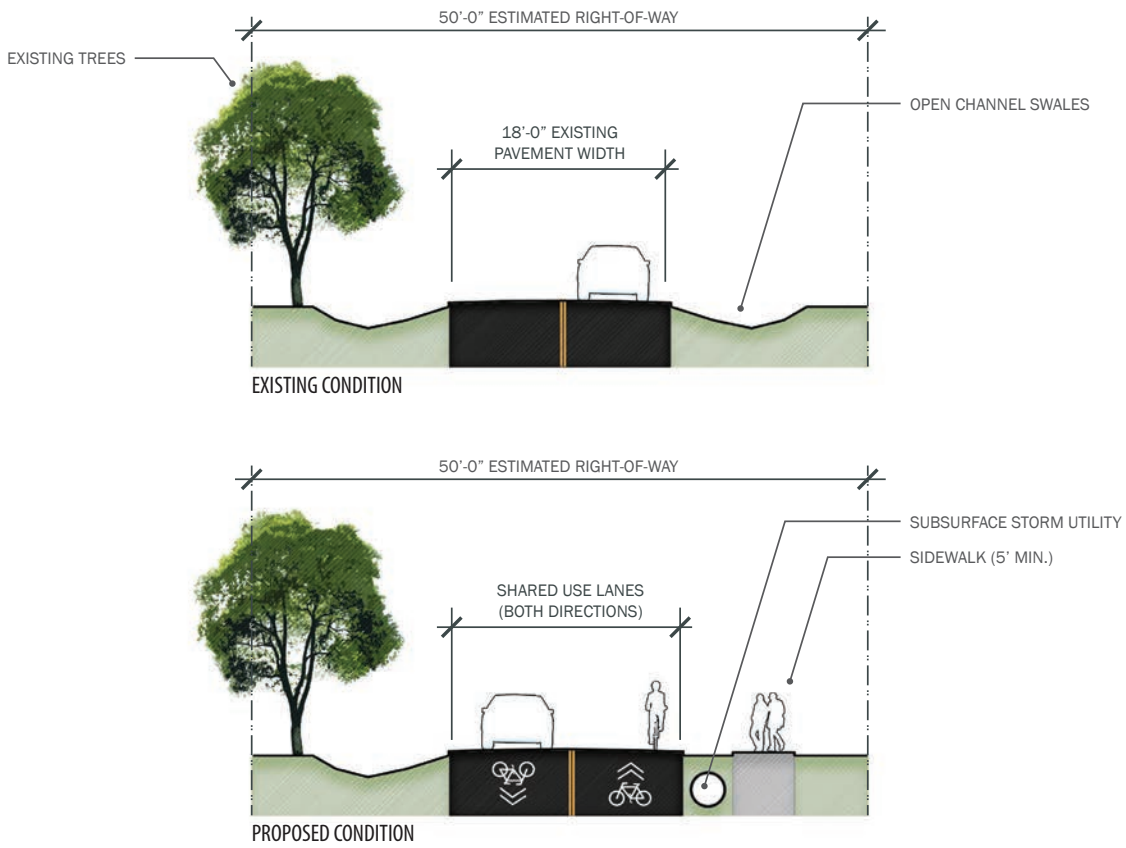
Cross-section study of existing and proposed conditions of typical corridor with 50' right-of-way
